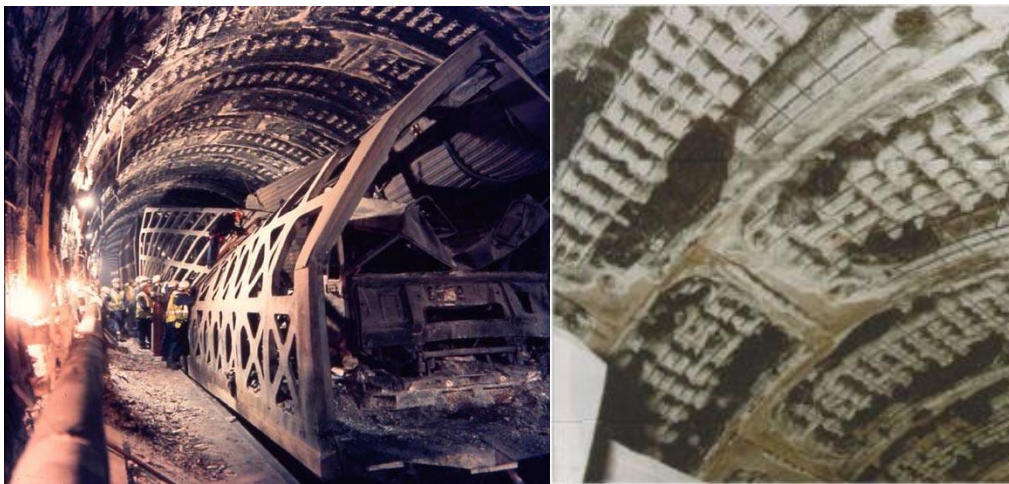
Damage to the lining of the Channel Tunnel caused by the fire.
